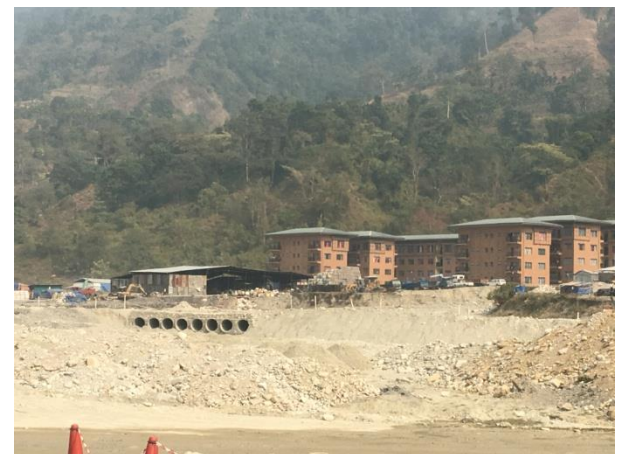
Hume pipe provided at diversion to ensure water flow across the road
